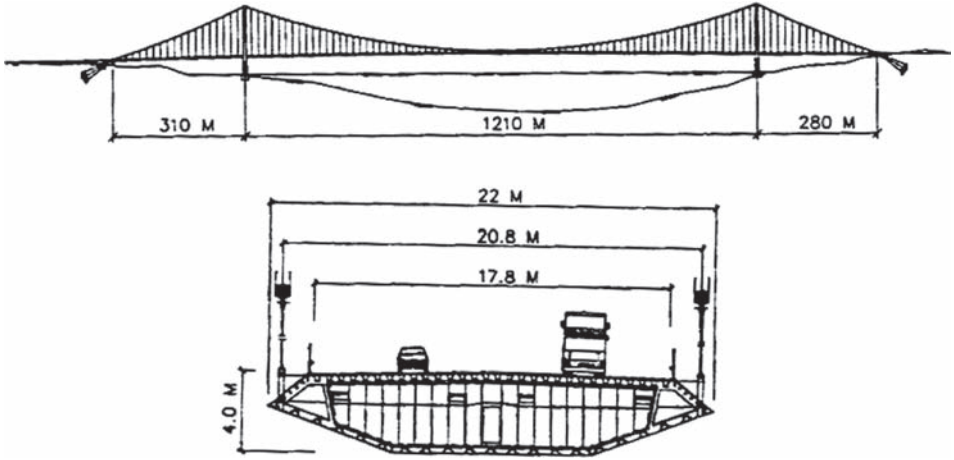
Elevation and cross section of the Höga Kusten Bridge.
